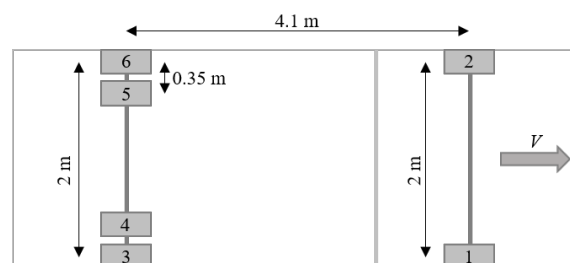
Top view illustration of the truckload arrangement used in La Ferrière.
